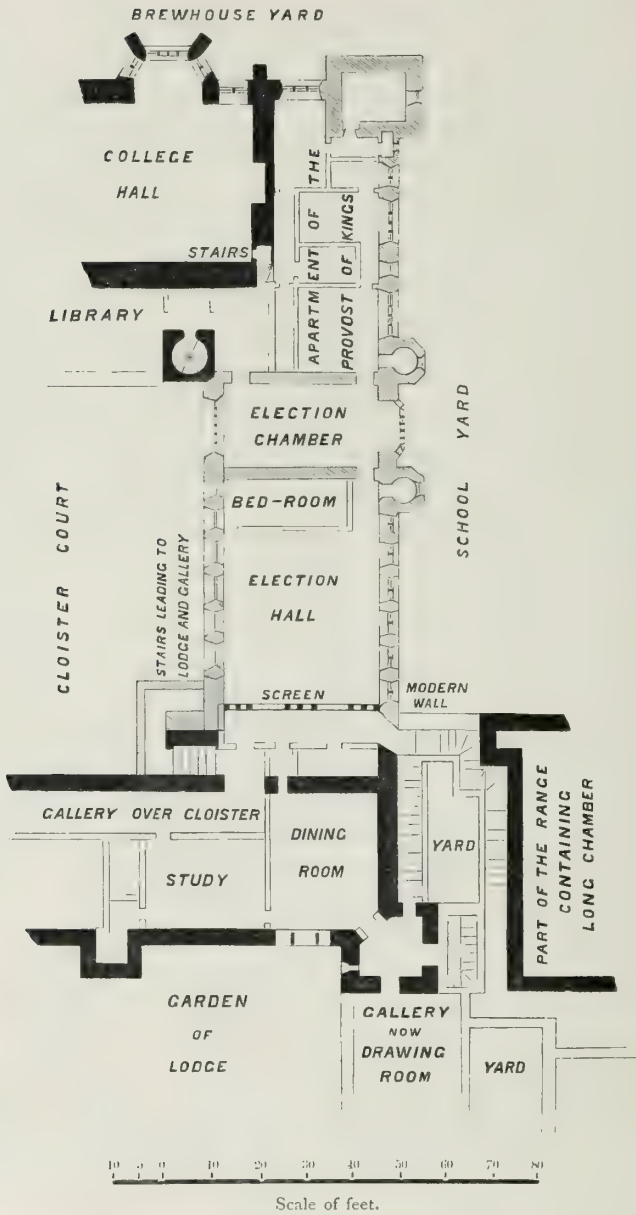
Plan of the first floor of the Provost's Lodge, Eton College.
